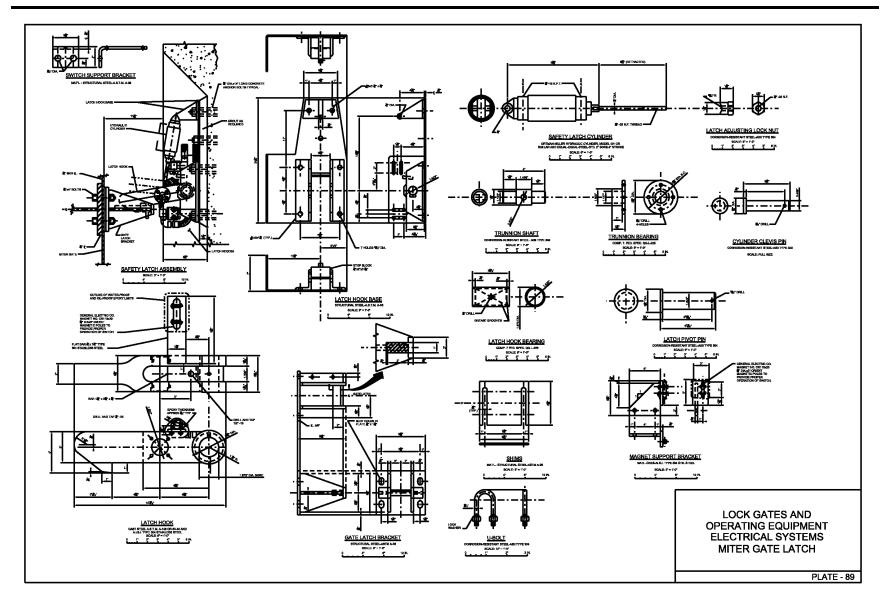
Plate 89: Lock gates and operating equipment, electrical systems, miter gate latch
